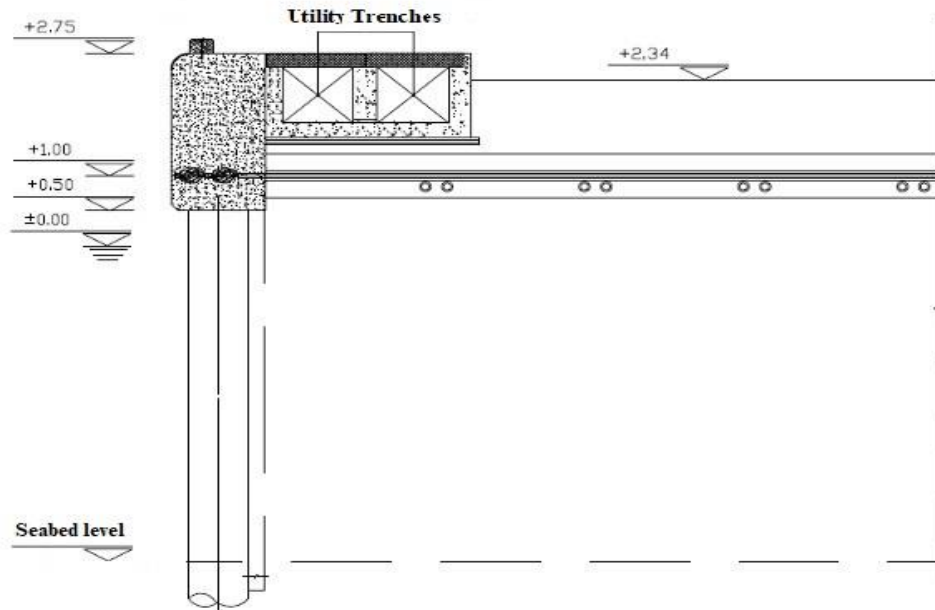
Cross section view of quay wall, berth 5, Bandar-e-Anzali Port, Iran
